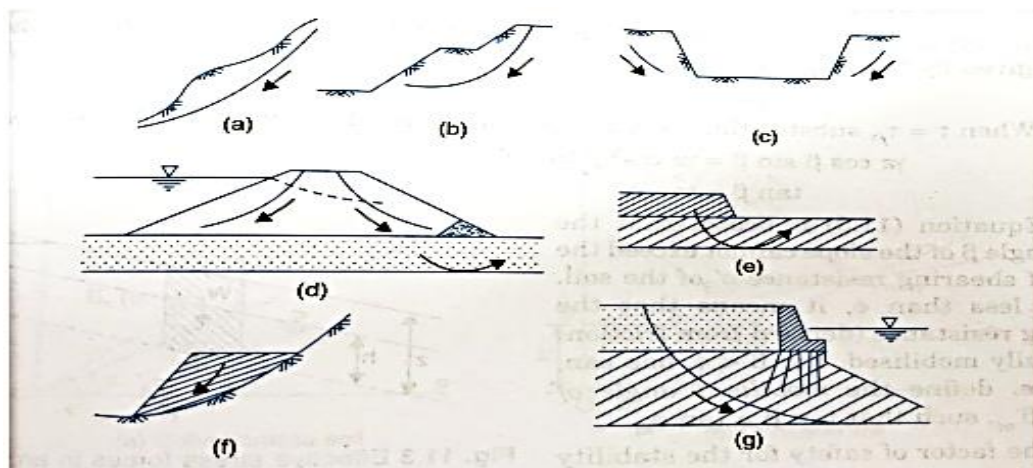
Different types of slopes (Source: Ranjan, G., and Rao.) (a) natural slope (b) cut slope (c) open excavation (d) earth dam (e) embankment over a poor soil (f) side hill fill (g) water front structure
